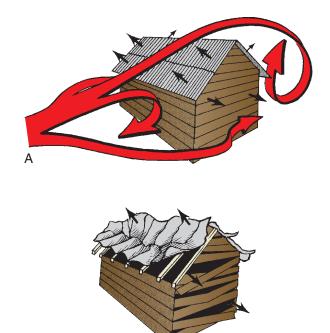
How high winds damage buildings. A, Wind blowing into a building is slowed at the windward face, creating high pressure. The airflow separates as it spills around the building, creating low pressure or suction at the end walls, roof, and leeward walls. B, The roof may lift off and the walls blow out if the structure is not specially reinforced. (Courtesy Disaster Management Center, University of Wisconsin–Madison.)
